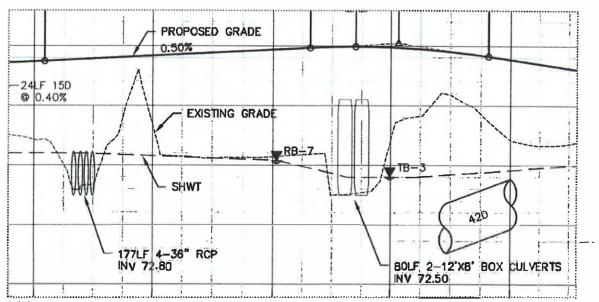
Cross-section view of Quad 36 and box culvert
